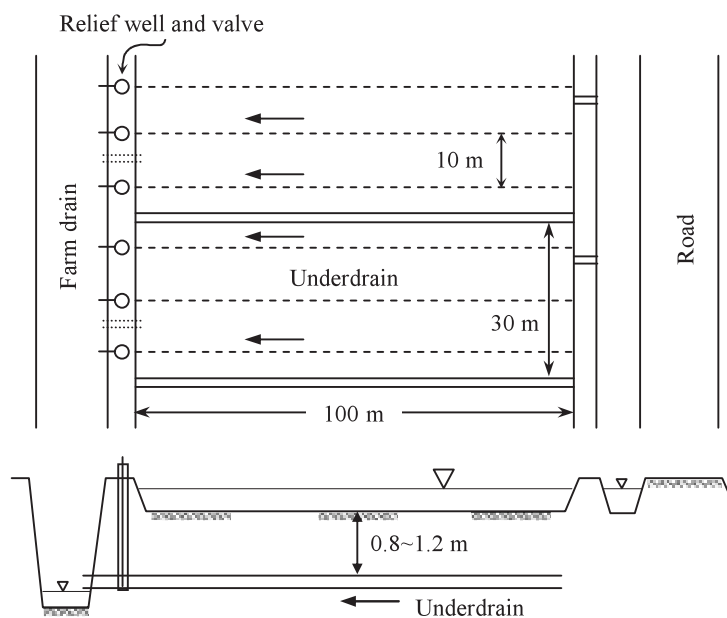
Typical layout of a subsurface drainage system in rice fields
